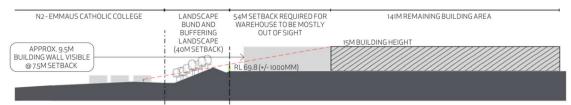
Cross section view - Building 3B profile (Source: AJ+C)
